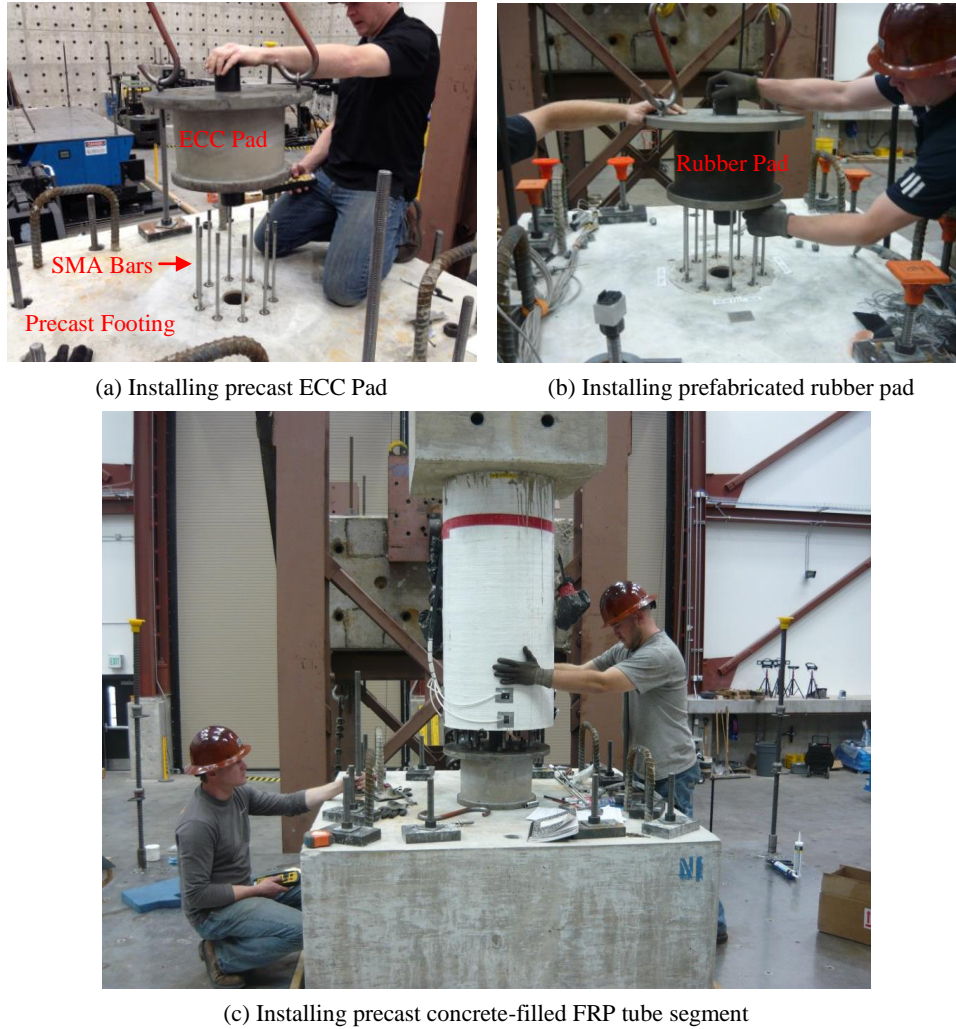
Deconstructible bridge columns incorporating low-damage materials
